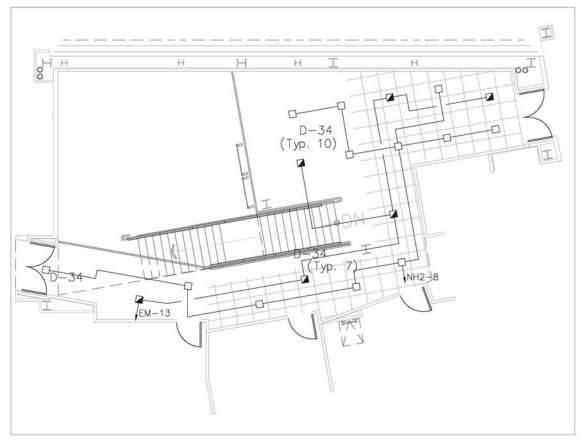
Atrium – Second Floor Lighting Layout and Circuiting
